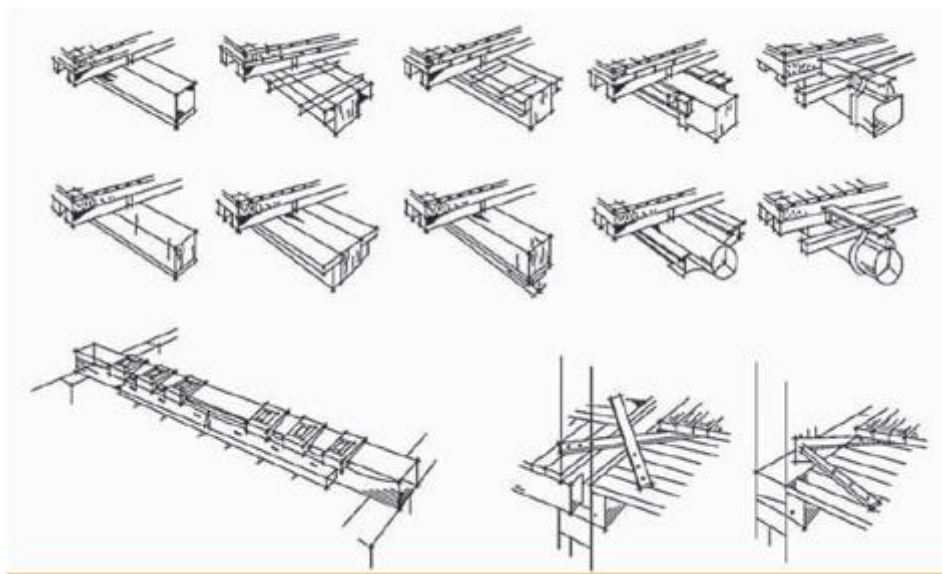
Reinforcement of wooden floor beams and girders with metal or wooden parts (13)
